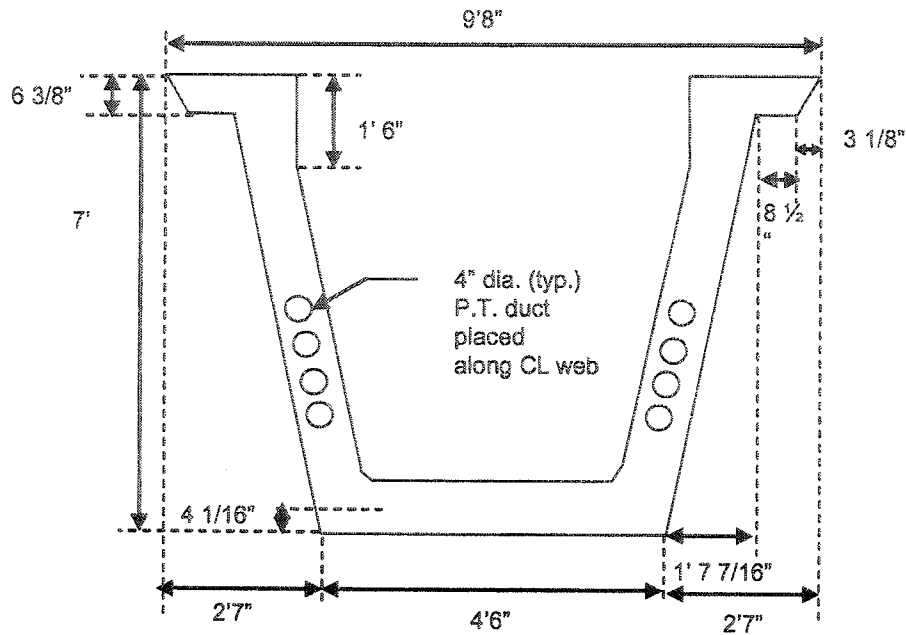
Cross Section of the End of the U-shaped Girder (not to scale)
